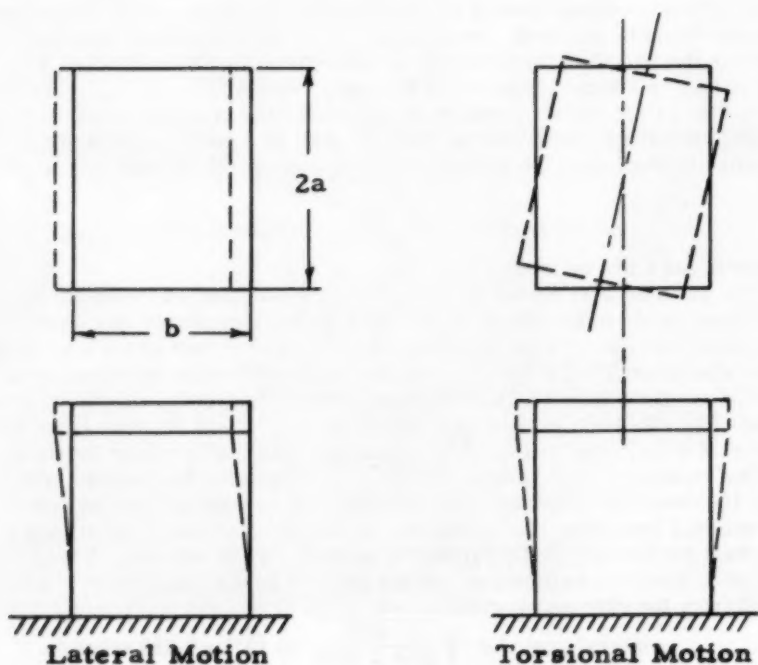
TORSIONAL AND LATERAL VIBRATIONS OF FLOOR SLAB
